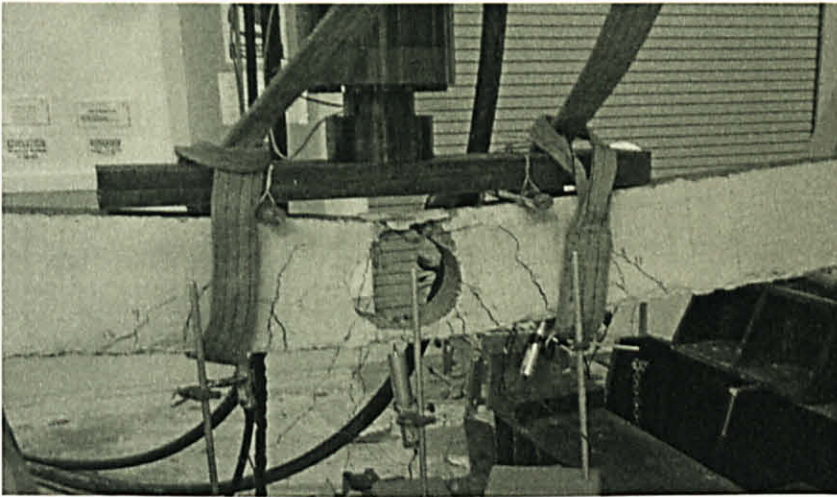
Failure of beam with large circular opening at middle of the beam
